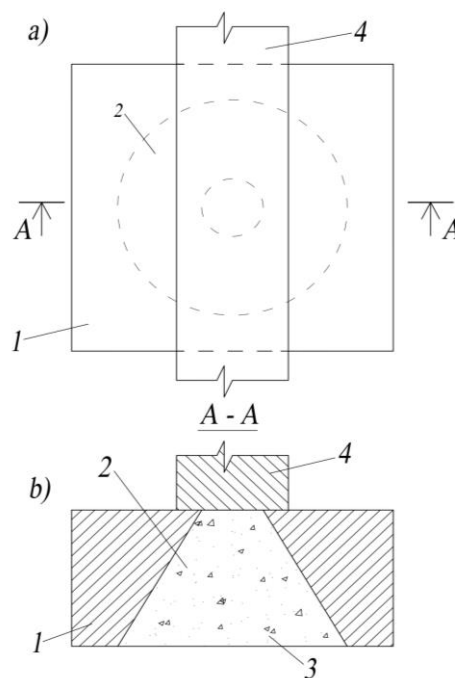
Hollow concrete foundation: a) Plan; b) Section.
